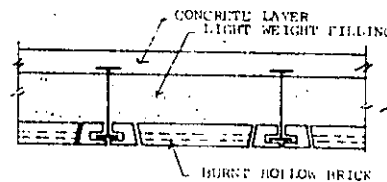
Concrete slab with ceramic plates supported by steel beams
